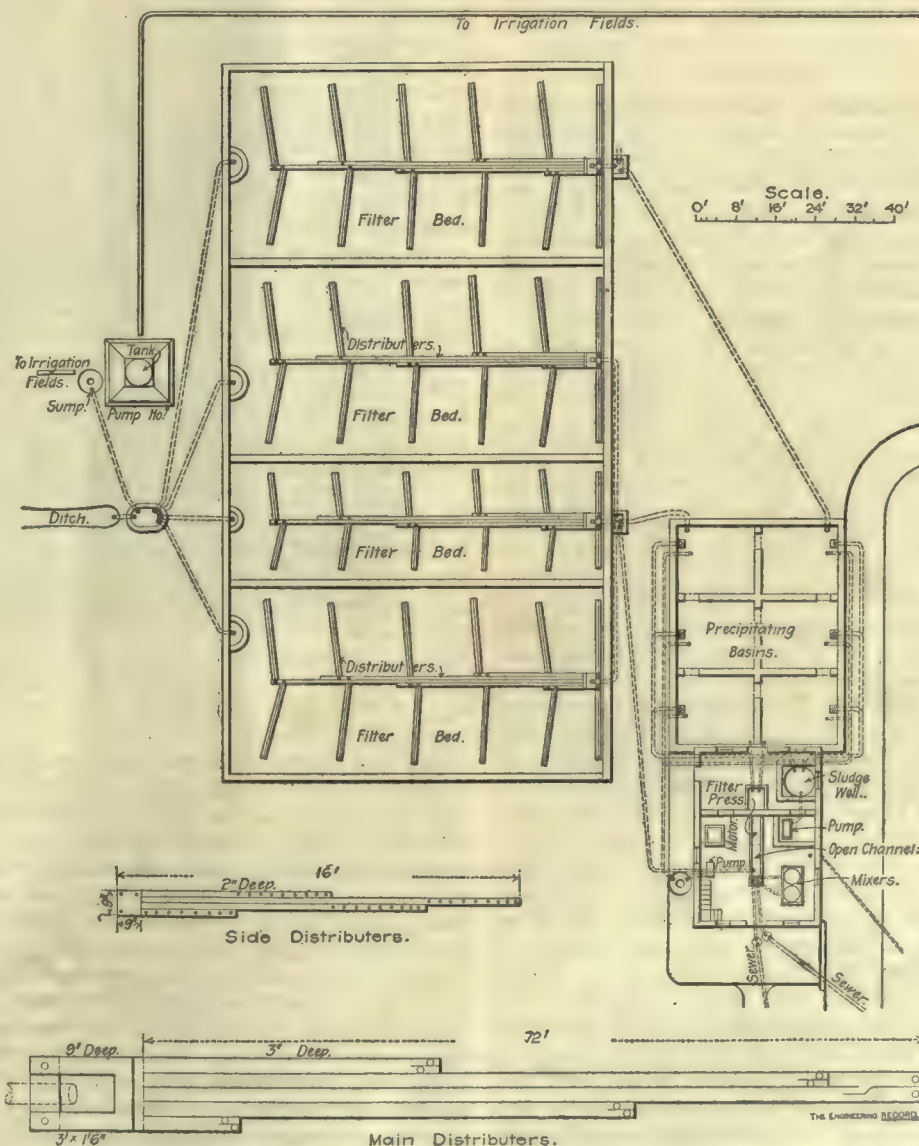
ARRANGEMENT OF SEWAGE DISPOSAL SYSTEM.
